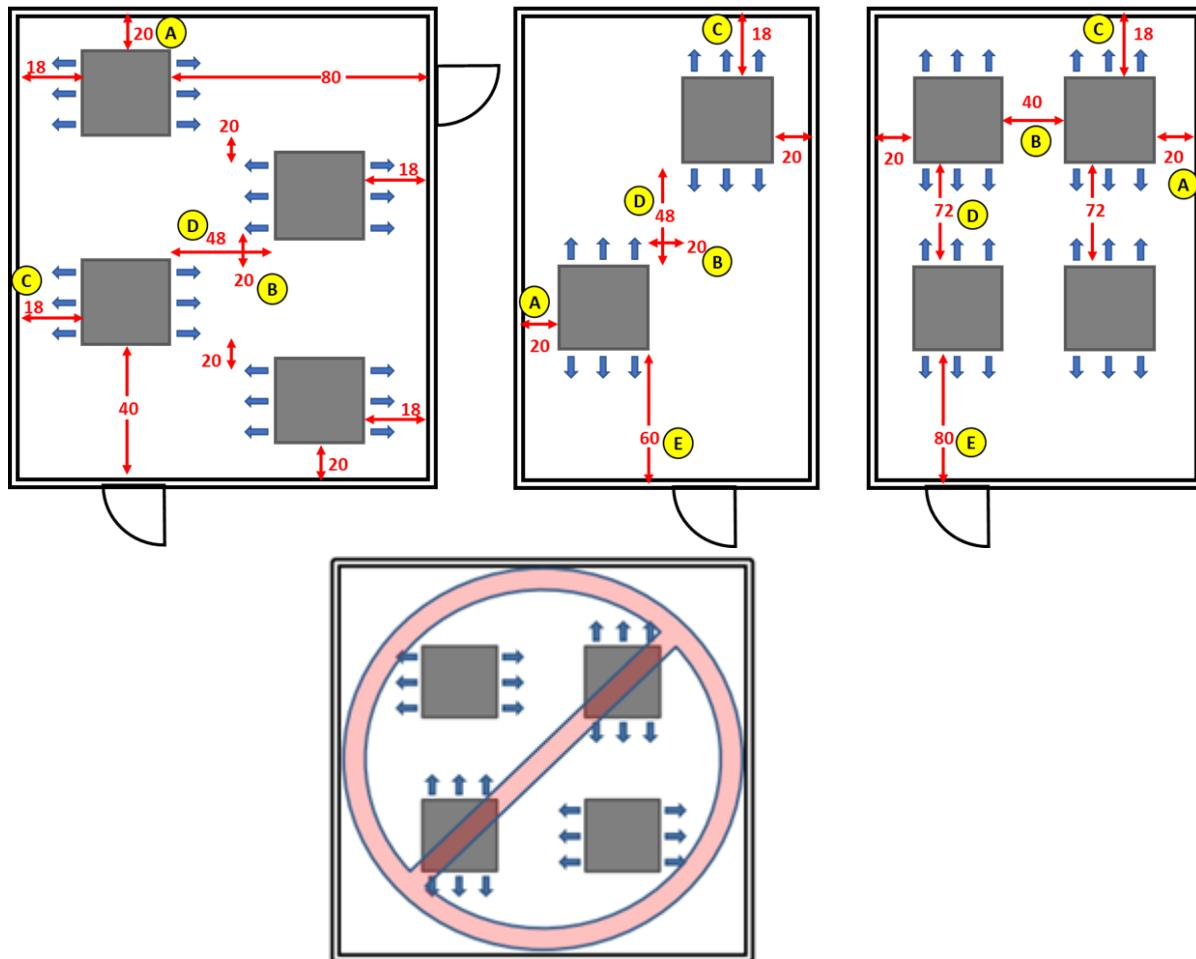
Roof Top Air Flow View - cold side – Minimum Distances for Installation
